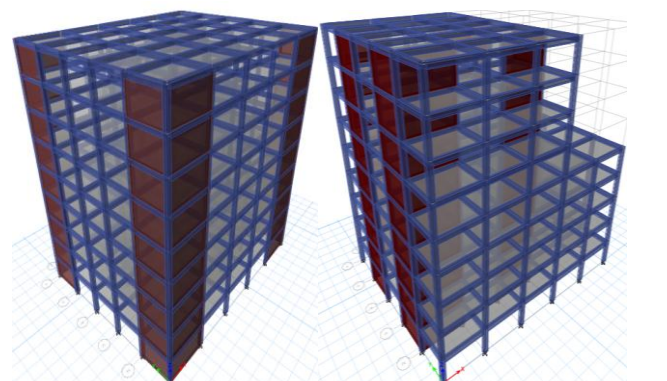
3d plan of model1 and model2 provided with shear wall respectively.
